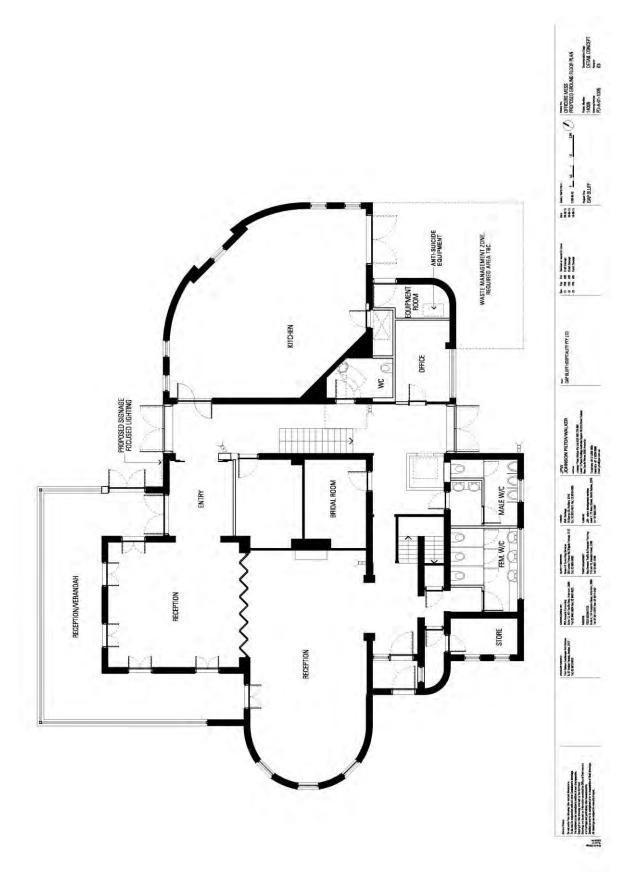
Proposed ground floor plan for the Officers' Mess. (Source: JPW 2015)
